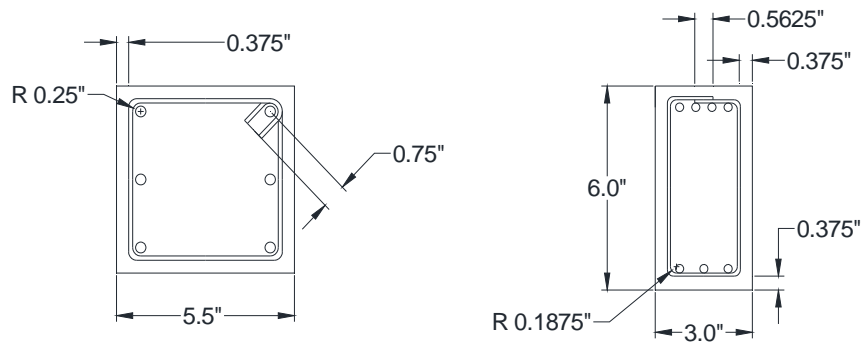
Transverse reinforcement detailing for quarter scale frame
